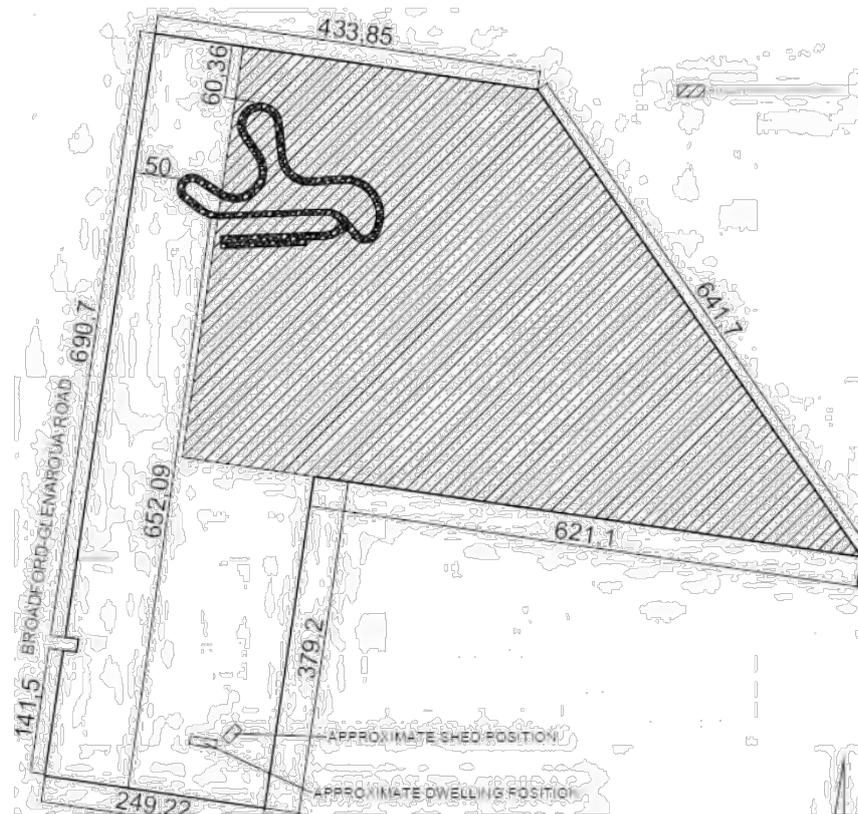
Extract of Proposed Site Plan (by applicant)
